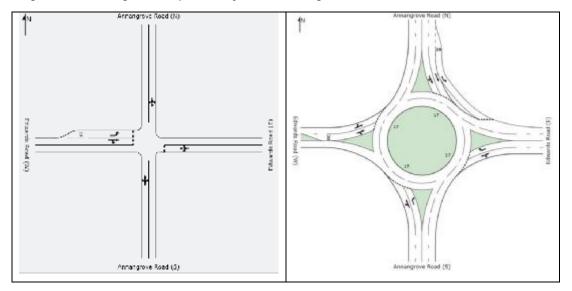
Existing and Proposed Layout at Annangrove Road/Edwards Road Intersection
